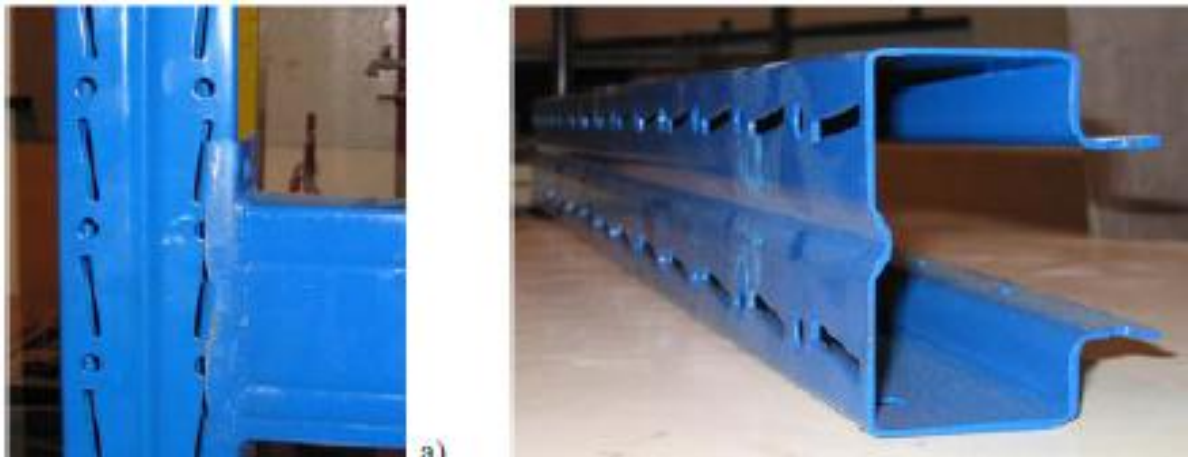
Specimens for beam-to-upright connection tests (connection and upright)
